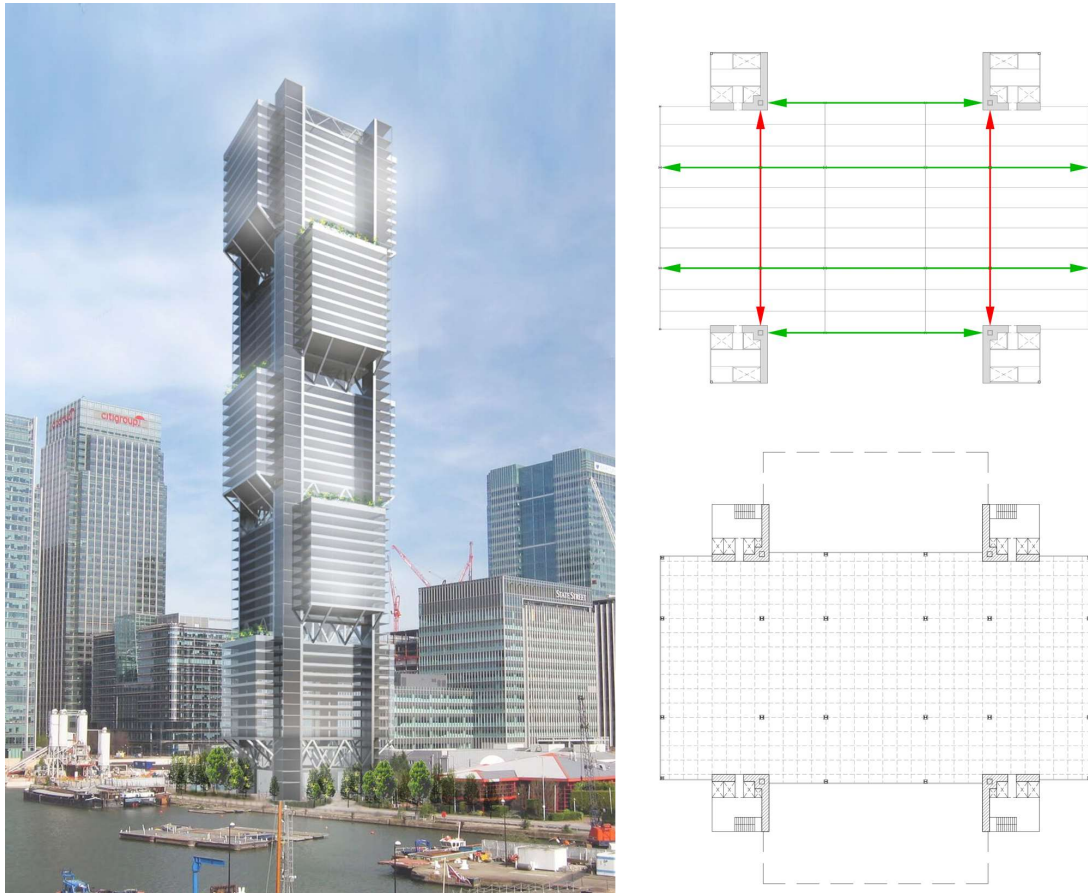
Tower visualization with architectural floor plan and structural plan with highlighted primary (red) and secondary (green) trusses.
